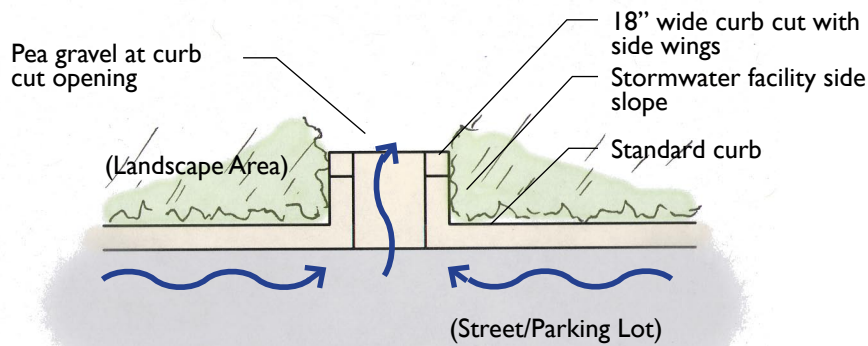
A standard curb cut allows stormwater runoff to enter a parking lot rain garden. This curb cut has 45 degree chamfered sides.
